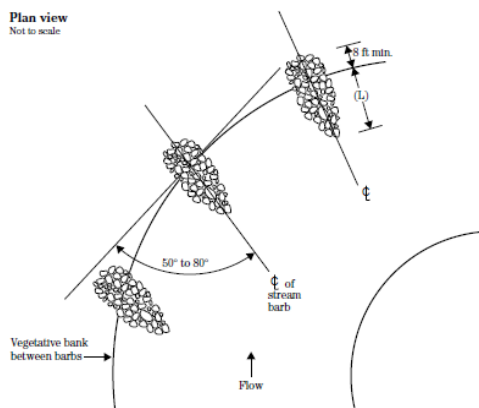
Plan view of a stream barb installation (USDA, 1996).
